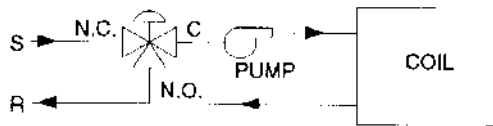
Mixing Valve in a Mixing Application Piped NC. to Coil
